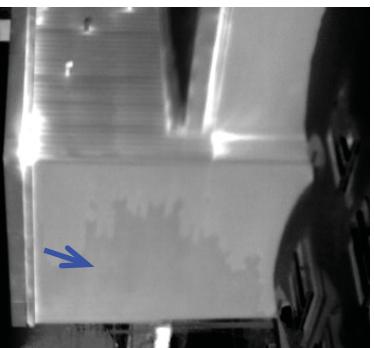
First example thermogram of interface of curtain wall and masonry wall assembly.
